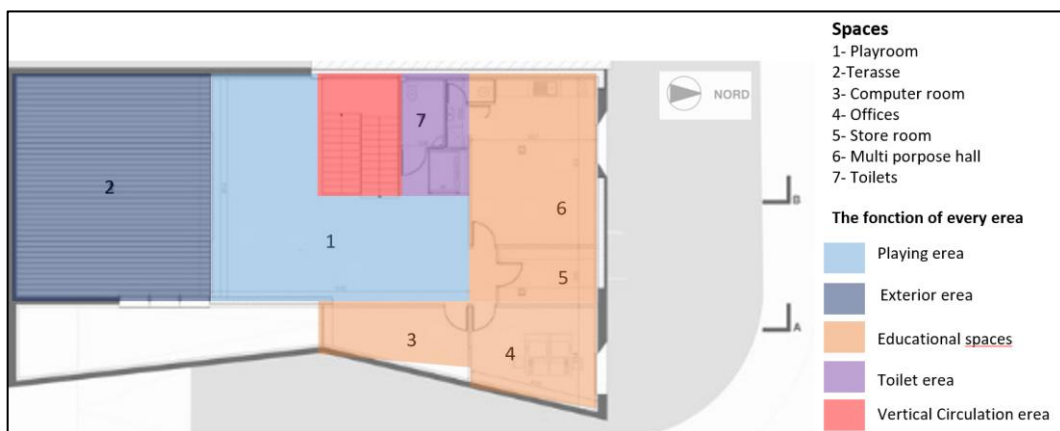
The 1st floor plan of Children's toy Library (Archidaily)
